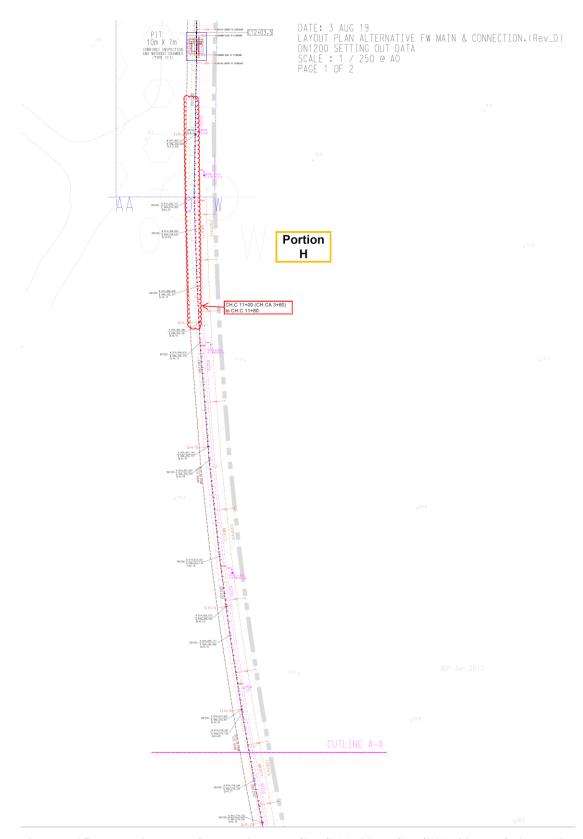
Location Plan for Portion H – CH.C 11+00 to CH.C 11+80 (TKO Area 137)
